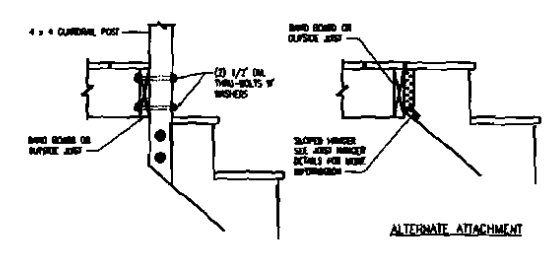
STAIR STRINGER CONNECTION DETAIL
